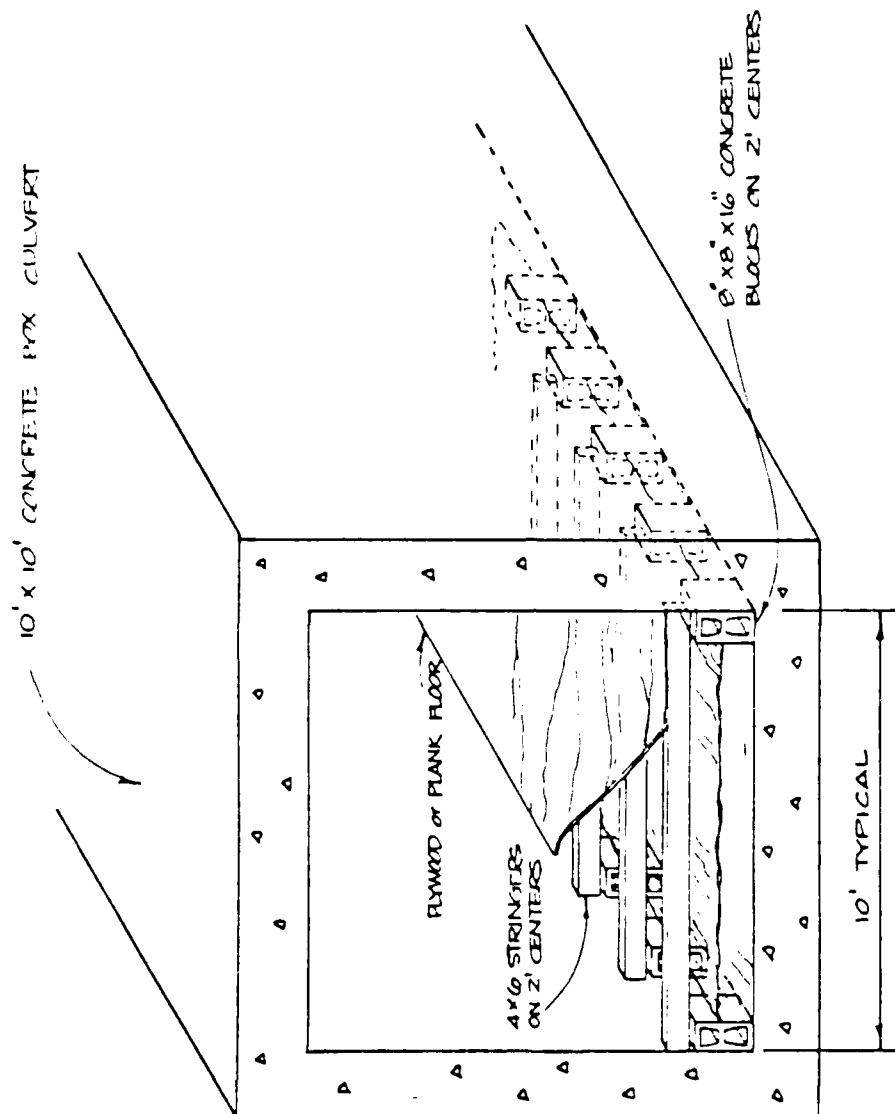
Box Culvert Host Area Shelter With Low-Flow False Floor.
